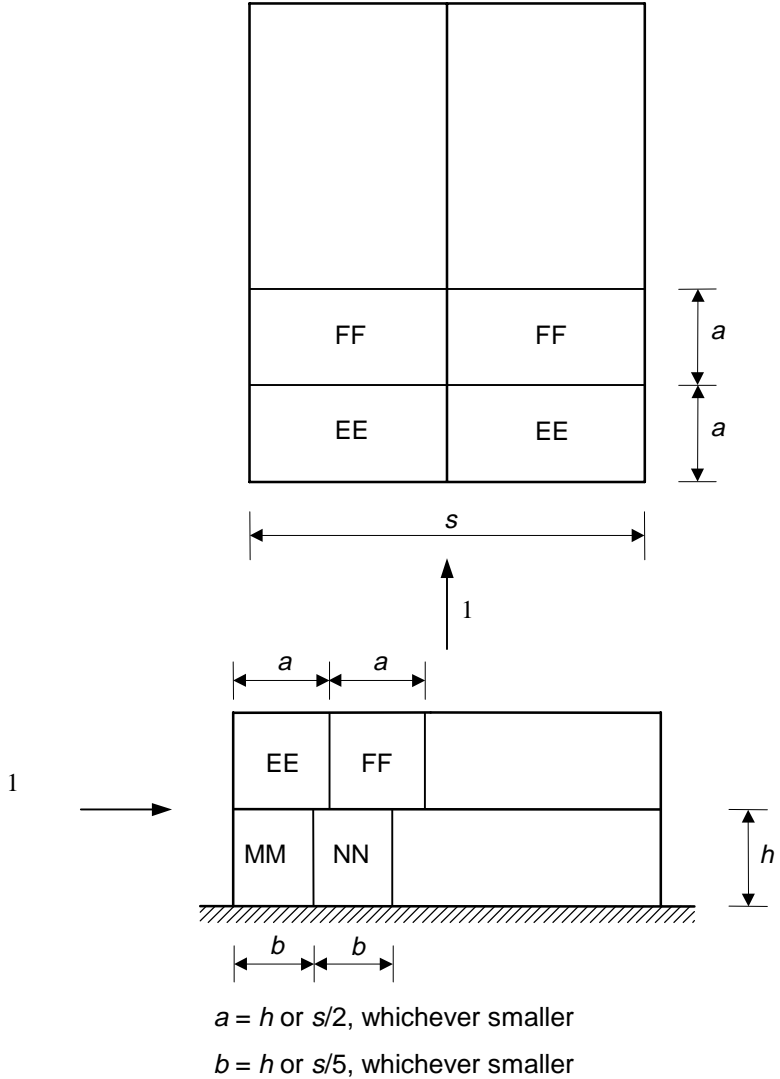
Zones for the walls and roofs of duo pitched greenhouses
